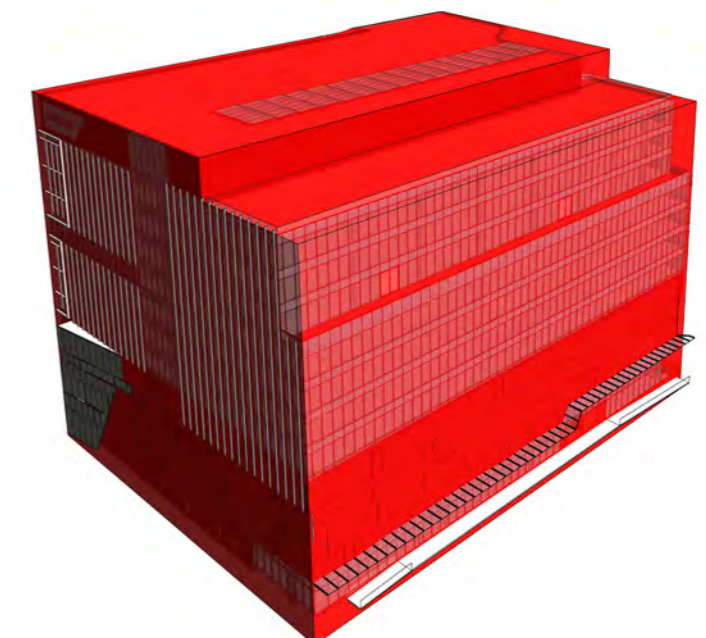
Parameter Plan envelope overlay. Aerial view at south west corner.
